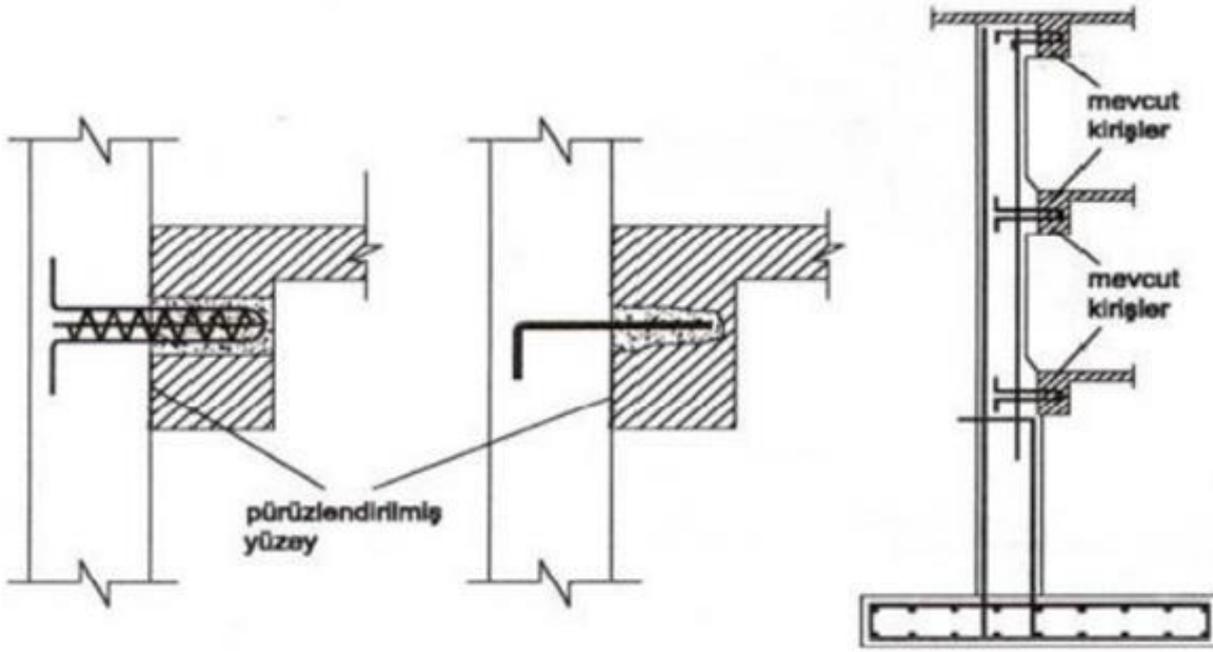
Connecting the exterior curtain walls to the adjacent frame with anchor rods (Öncü, 2011)
